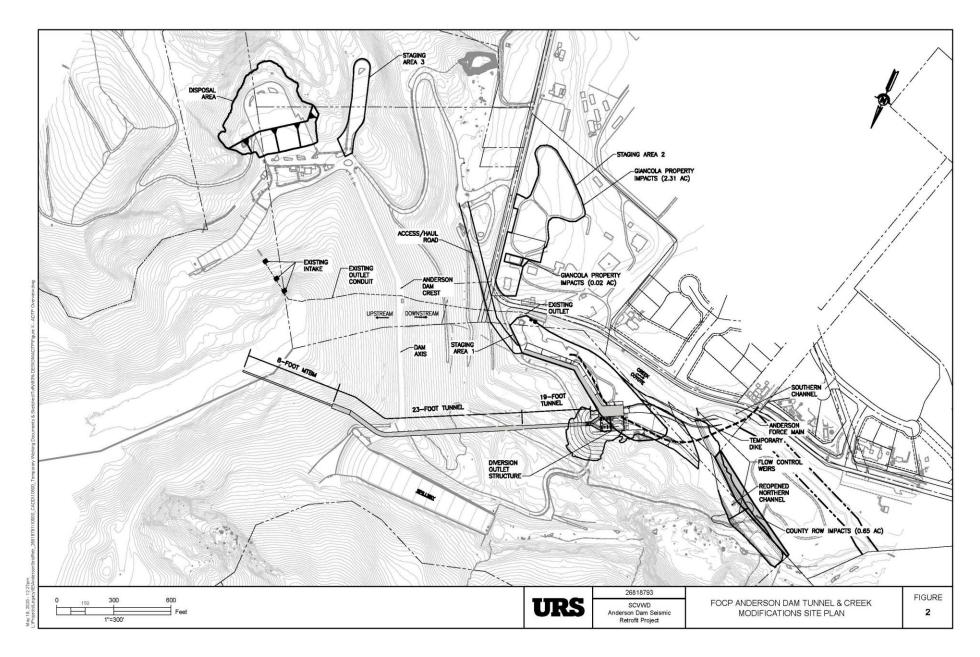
FOCP Anderson Dam Tunnel & Creek Modifications Site Plan
